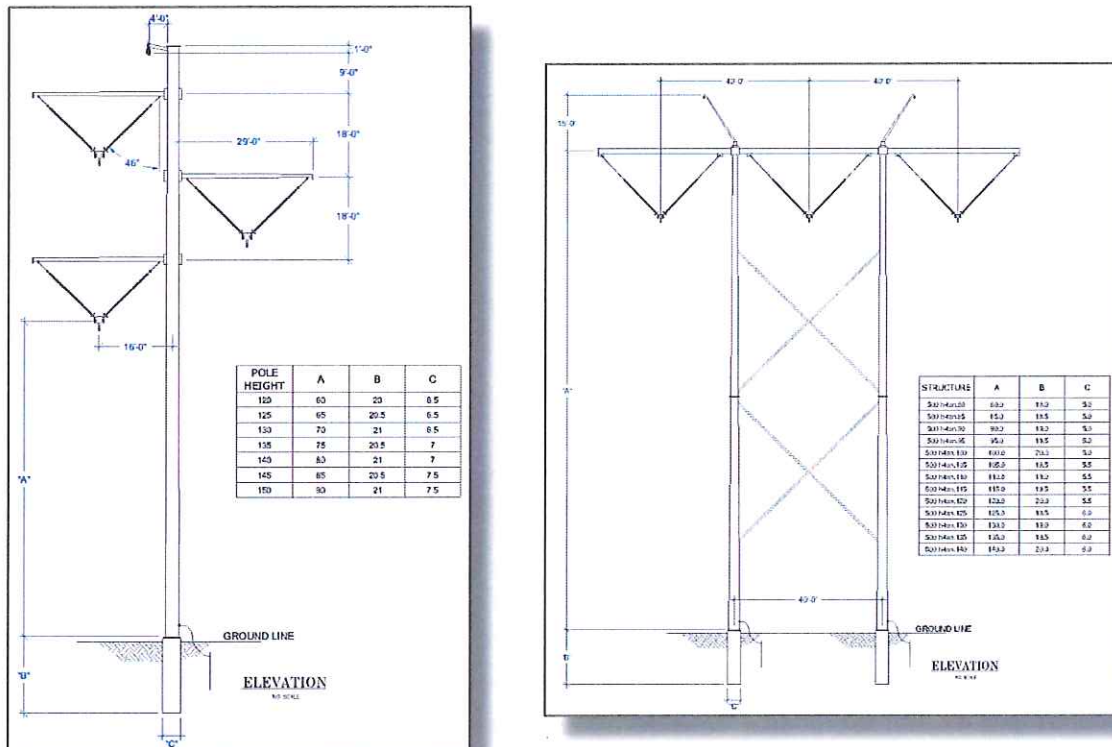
Typical 500 kV Structure Types used for Conceptual Design
